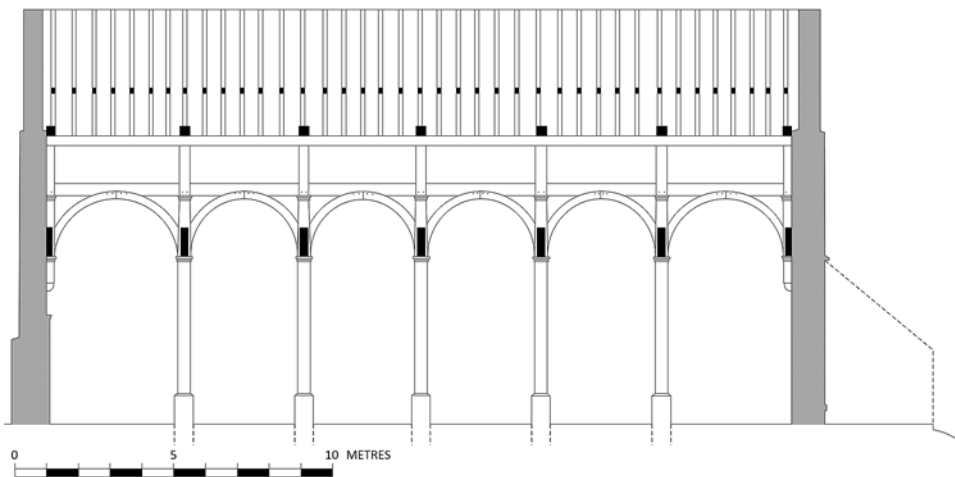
Leicester Castle Hall: long section reconstructed as original.
